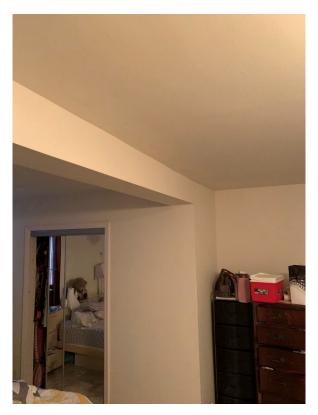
Front Bedroom/Converted Garage Girder & Column (Covered - Looking Southeast)
